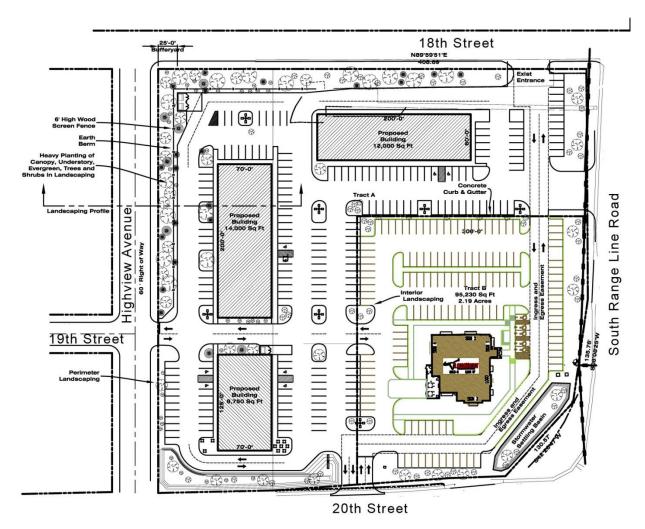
Recent Site Plan on South Range Line Road backing onto South Highview Avenue. [Source: O'Donnell III Architect.]
